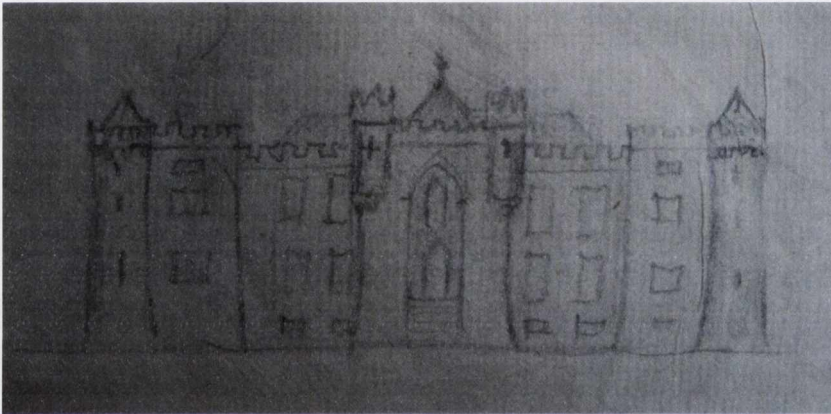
Birr Castle, sketch of proposed north elevation, Laurence Parsons, [1802–1803], Sketch notebook, f. 9r.
